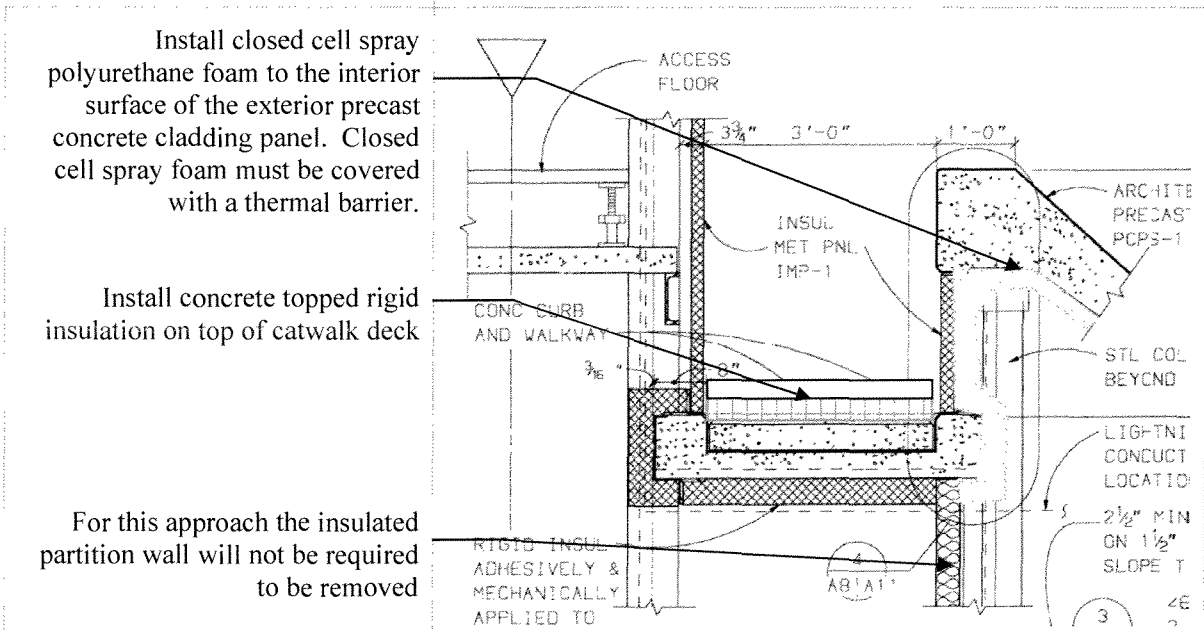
Cable Access Retrofit Section 1 (Alternate)
